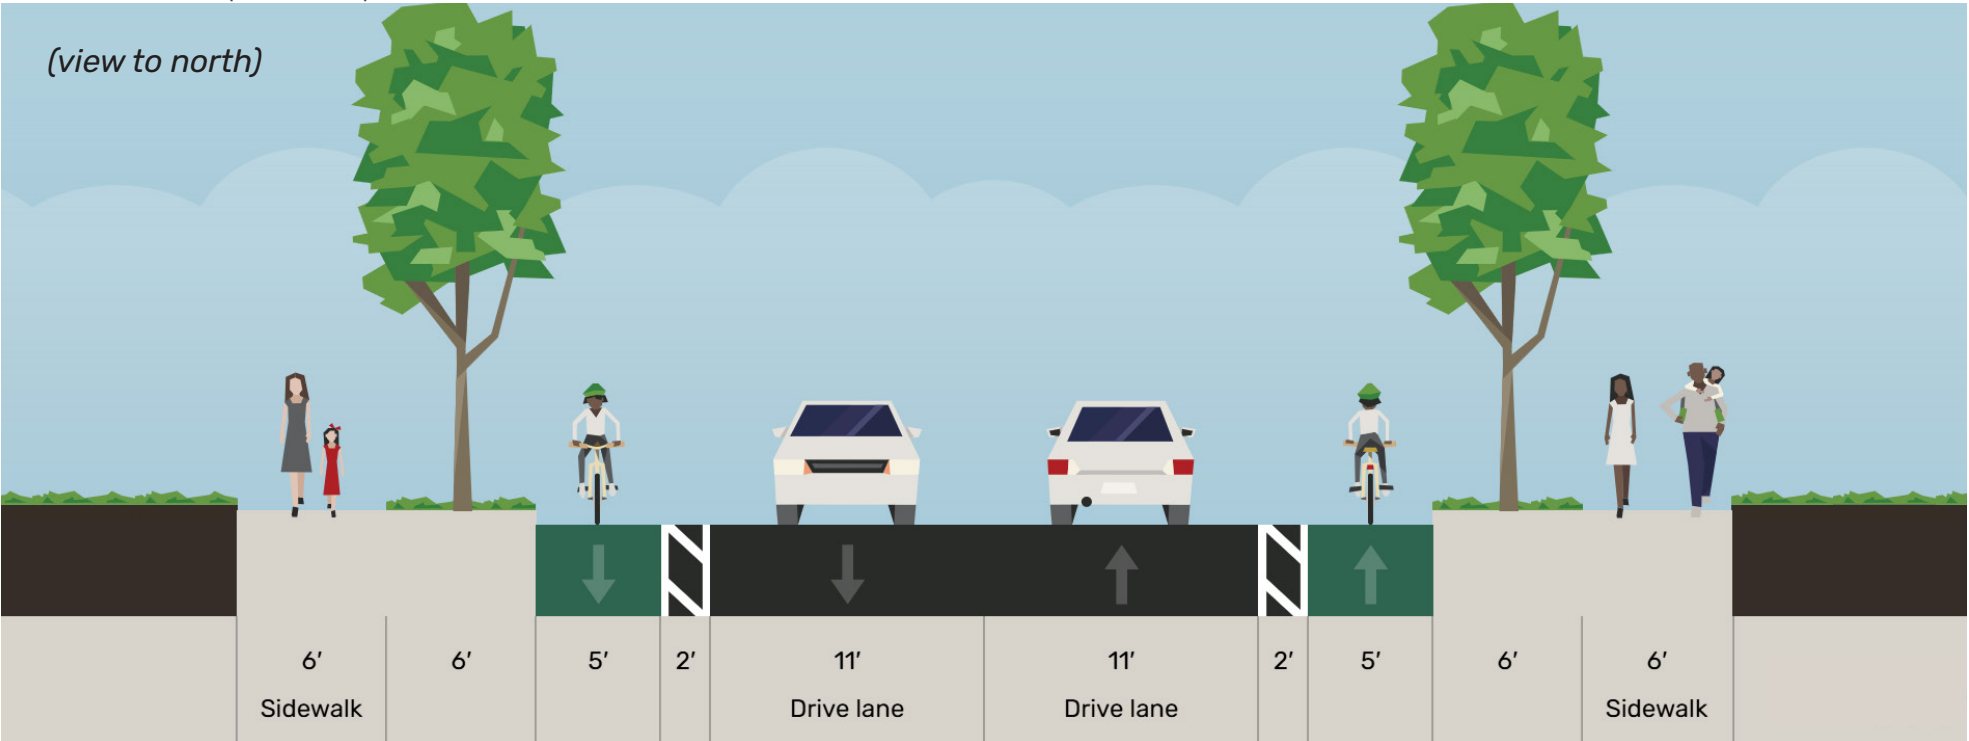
Proposed Typical Cross-Section on Tower Ridge Drive from Lake Sharon Drive to Brookview Drive (60’ ROW)
